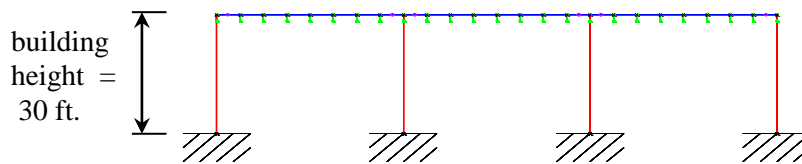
Side elevation view of building models with 3 bays along the width (total width = 120 ft.).
